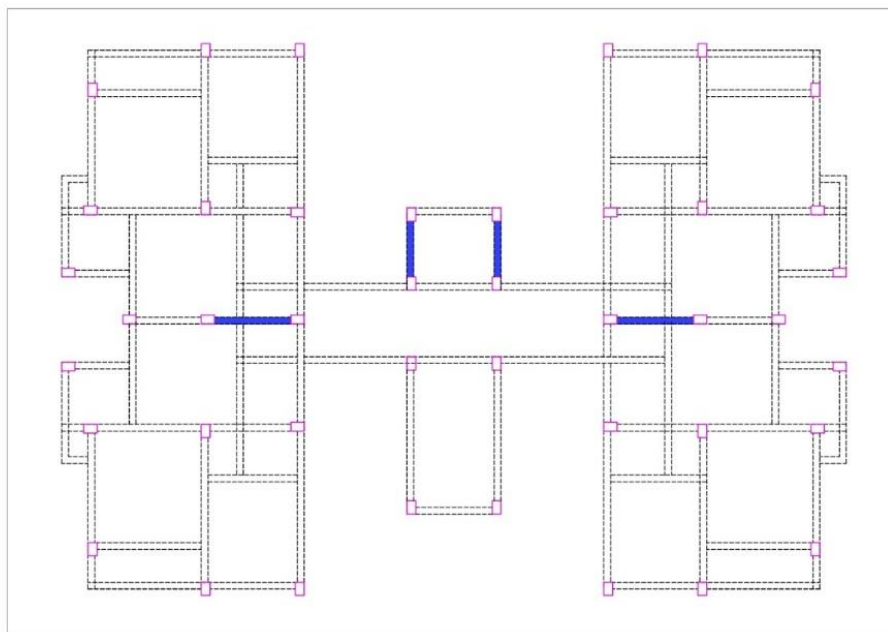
(b): Model 4 – Plan highlighting the location of Shear Wall
